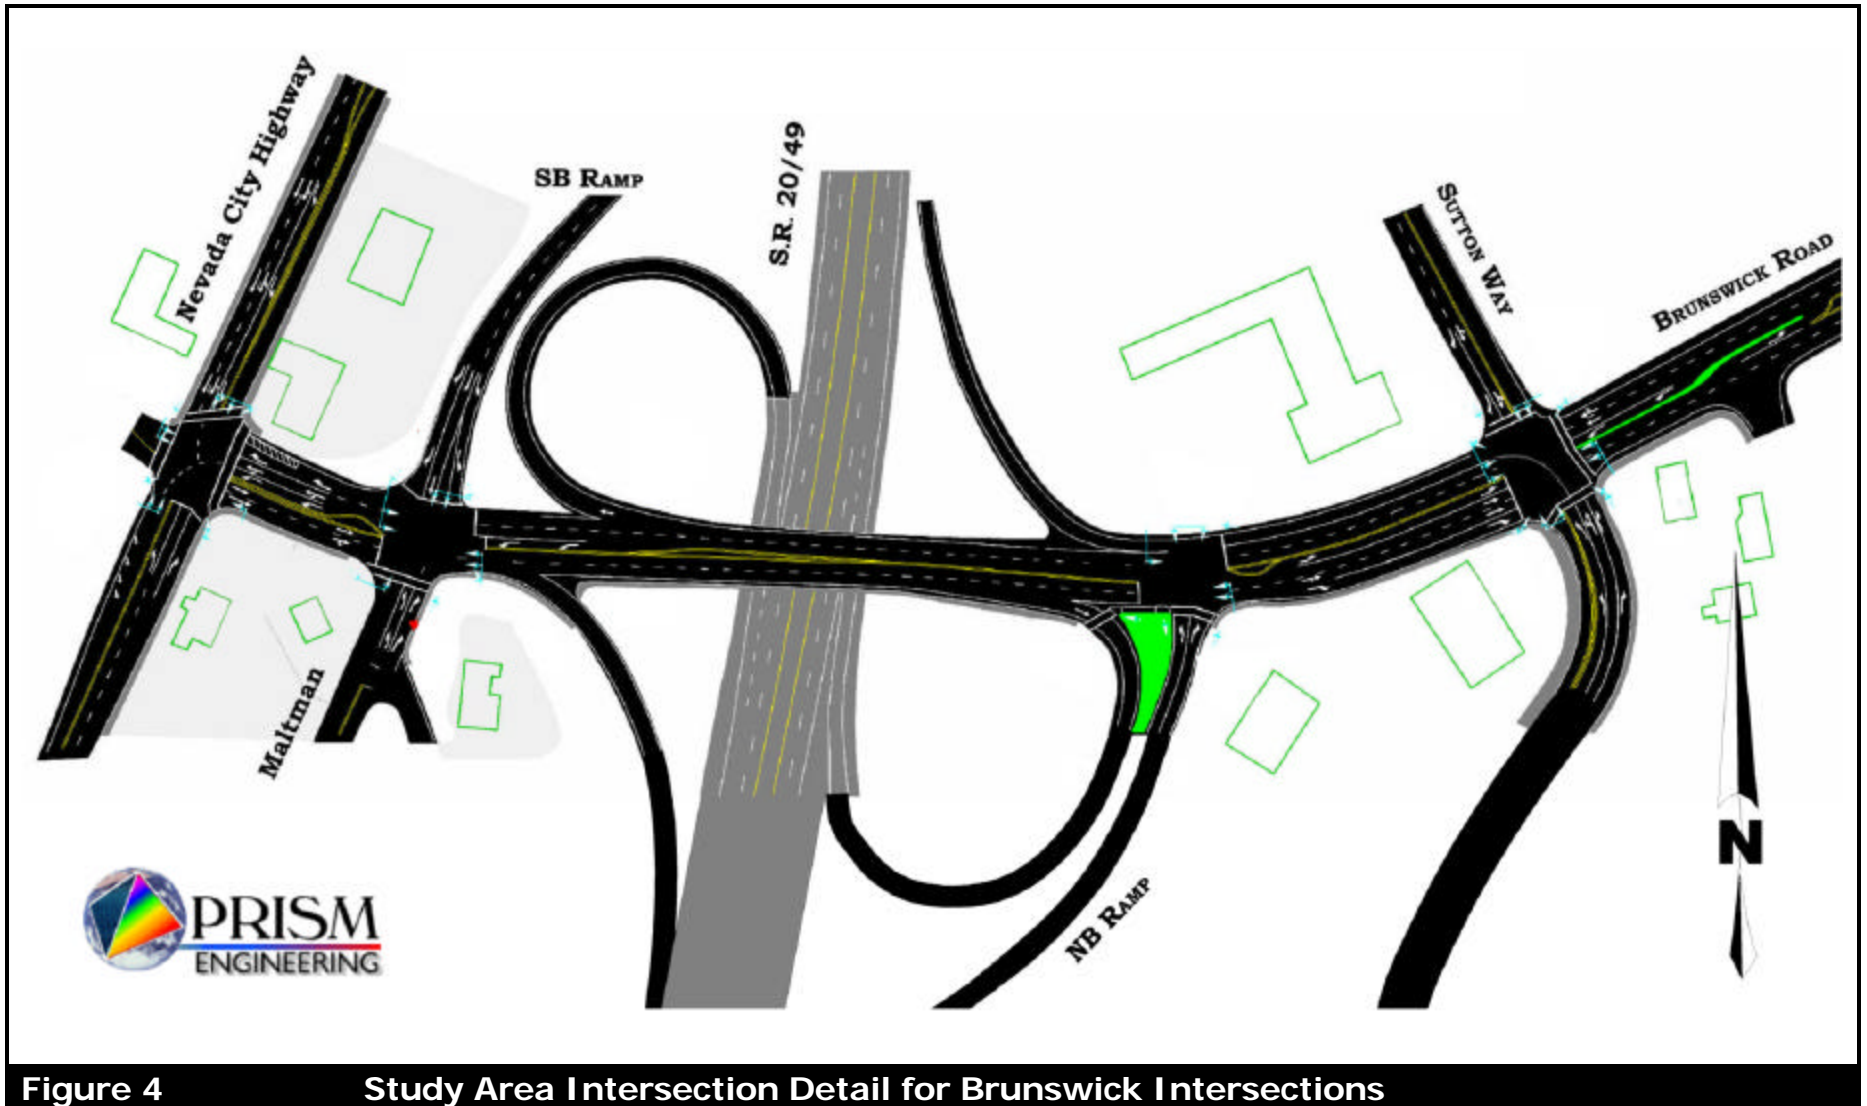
Study Area Intersection Detail for Brunswick Intersections
